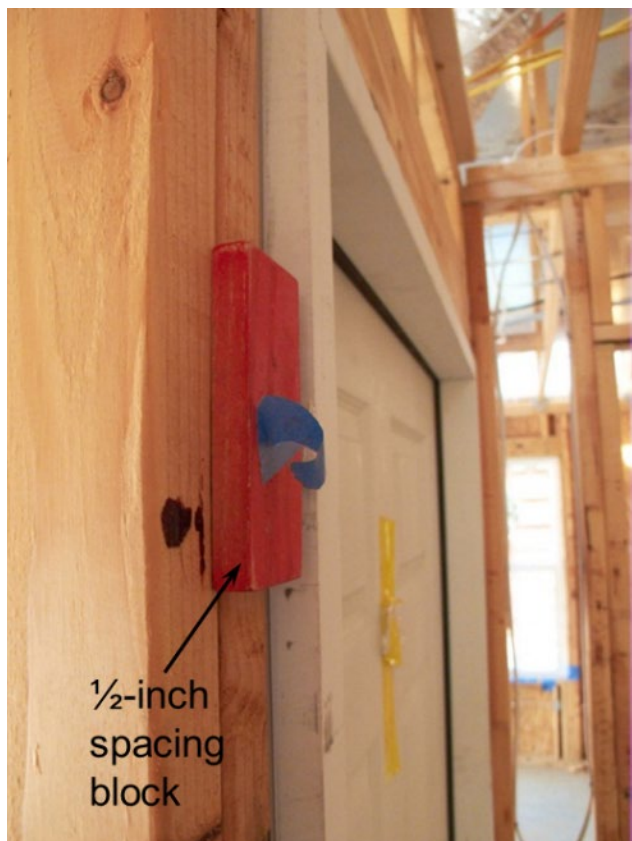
Use $\frac{1}{2}$ -Inch Blocks (in Red) to Allow for Drywall
